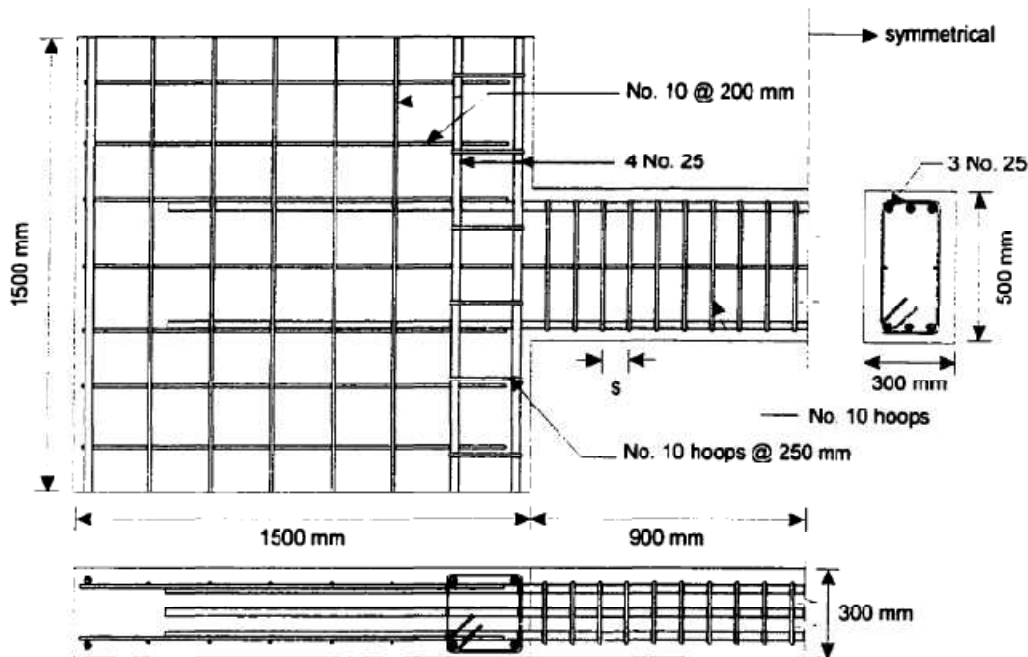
Section and Reinforcement Details for Specimen NR4 (Bristowe 2000)
